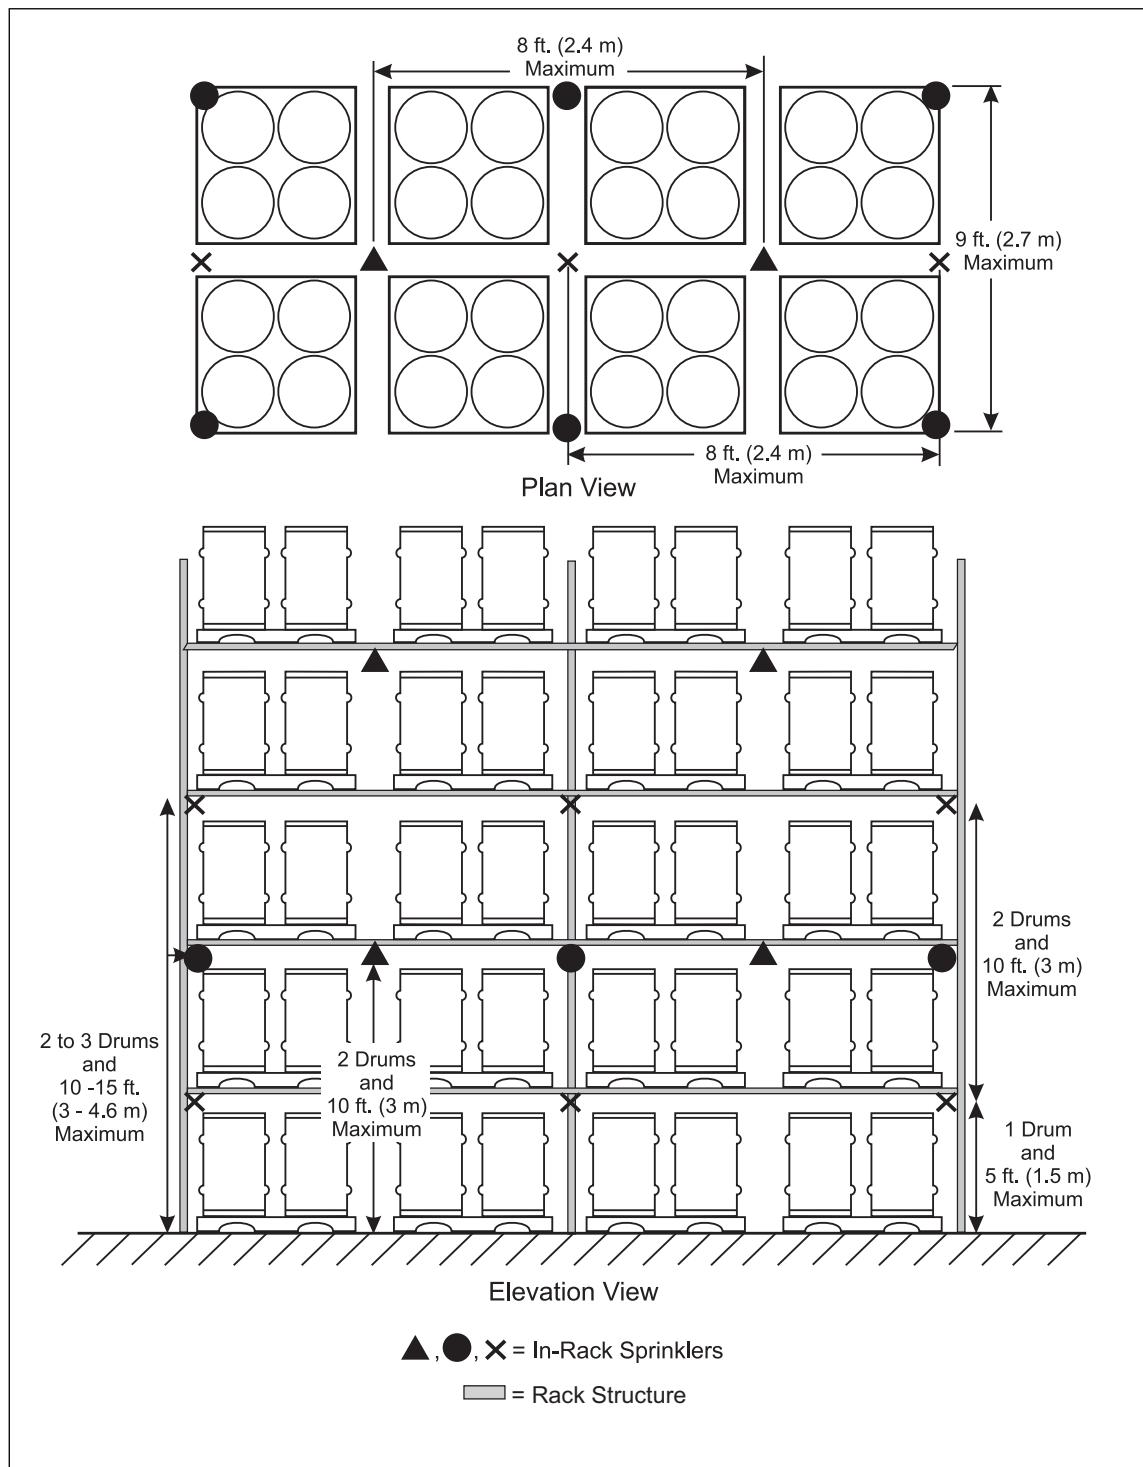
Double-row rack sprinkler layout: drum protection scheme
